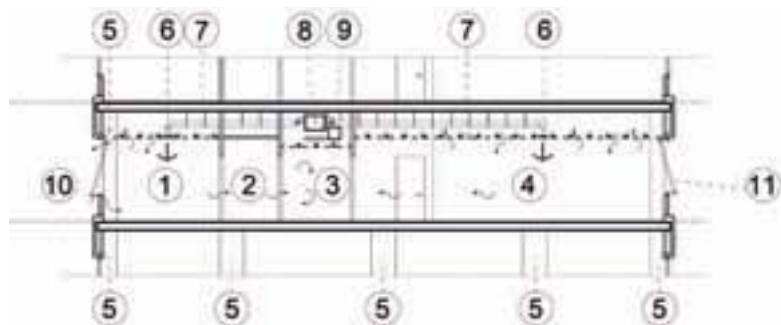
Cross-section through a typical floor in Addenbrooke's Hospital ward tower
